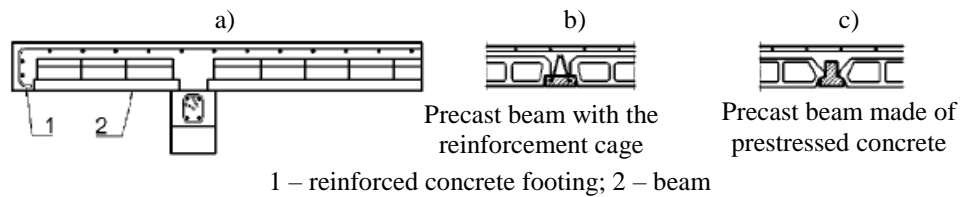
Structural solution for a cantilever overhead of a slab with flushing precast beams:
